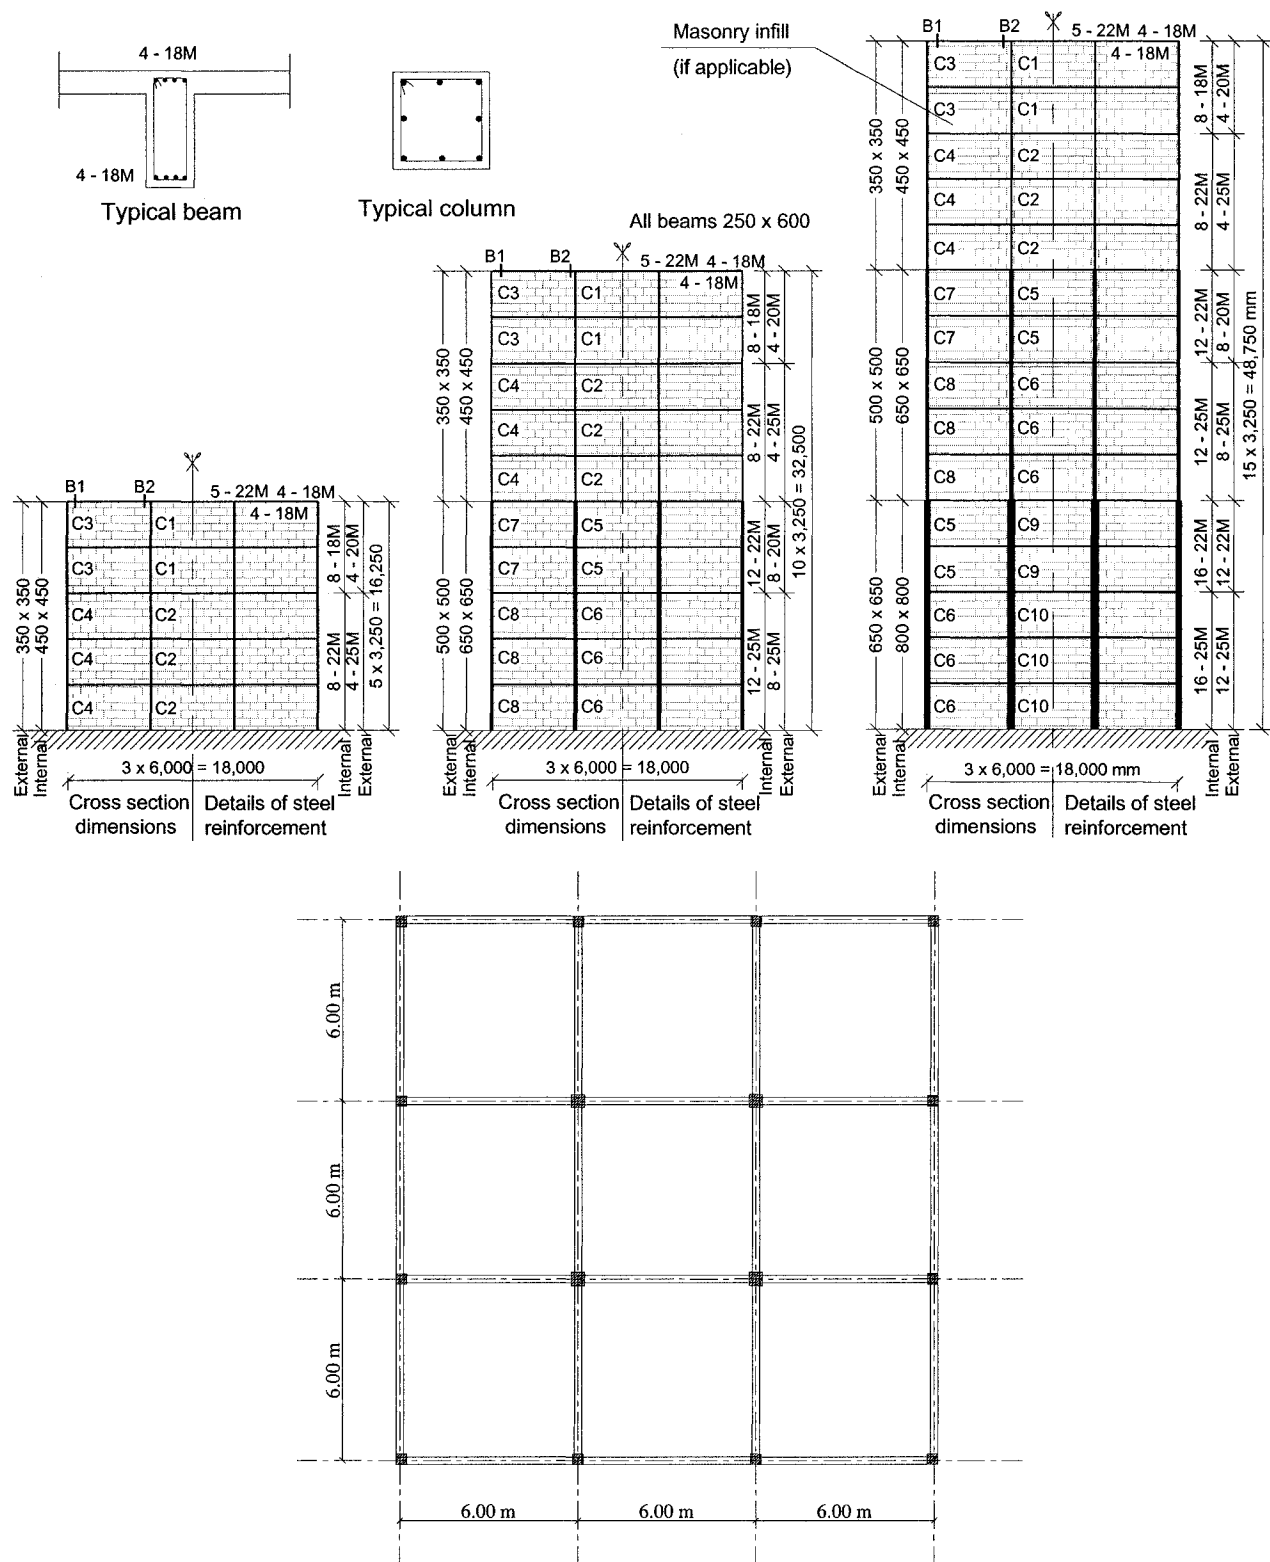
Elevations and plan of the studied 5, 10 and 15 storey frames.
